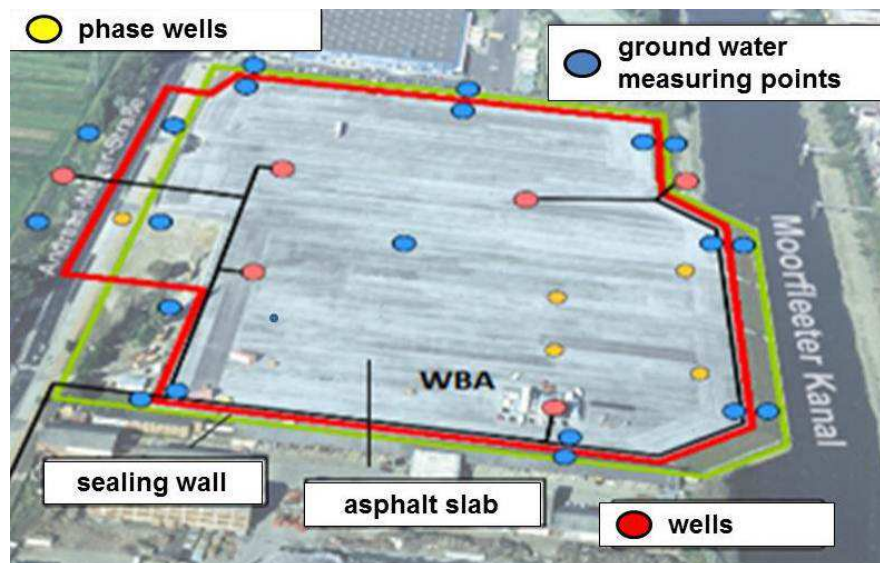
Redevelopment of a contaminated site in Hamburg Moorfleet
